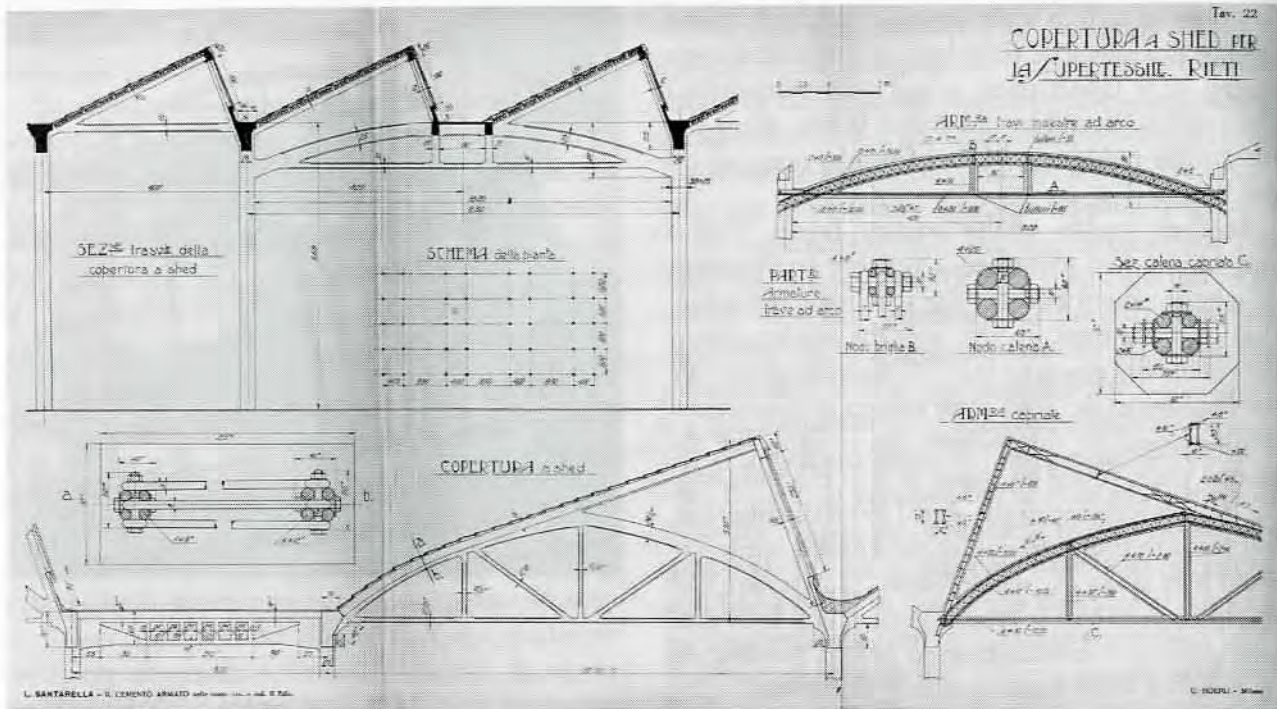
The final design of some trusses and roofing (Santarella 1928).
